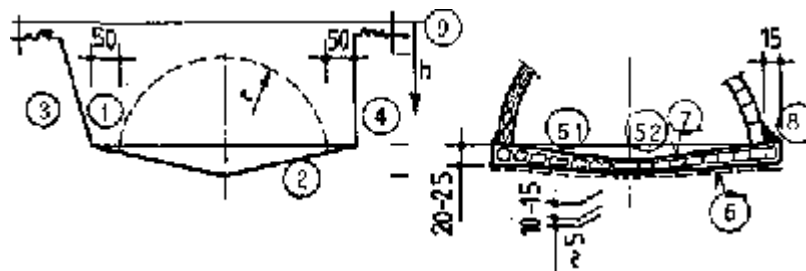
Level line, excavation and foundation. 1 Workspace, 2 Inclination of conical foundation, 3 Sloping excavation, 4 Vertical excavation, 51 Quarrystone foundation, 52 Brick foundation, 6 Packing sand, 7 Mortar screed, 8 Foot reinforcement for fixed-dome plant, 9 Level line [7].
